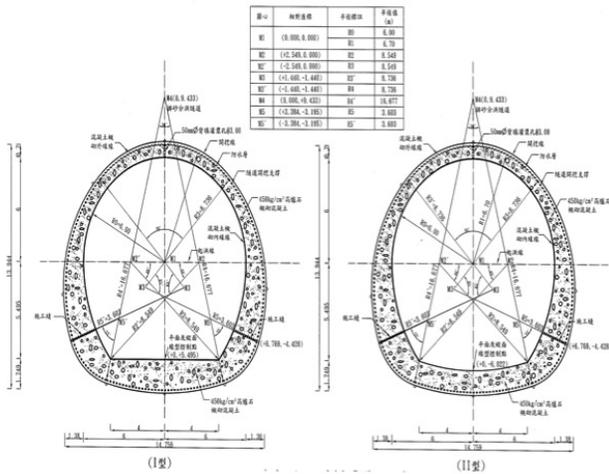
Shihmen Reservoir Diversion Tunnel Standard Design Section
